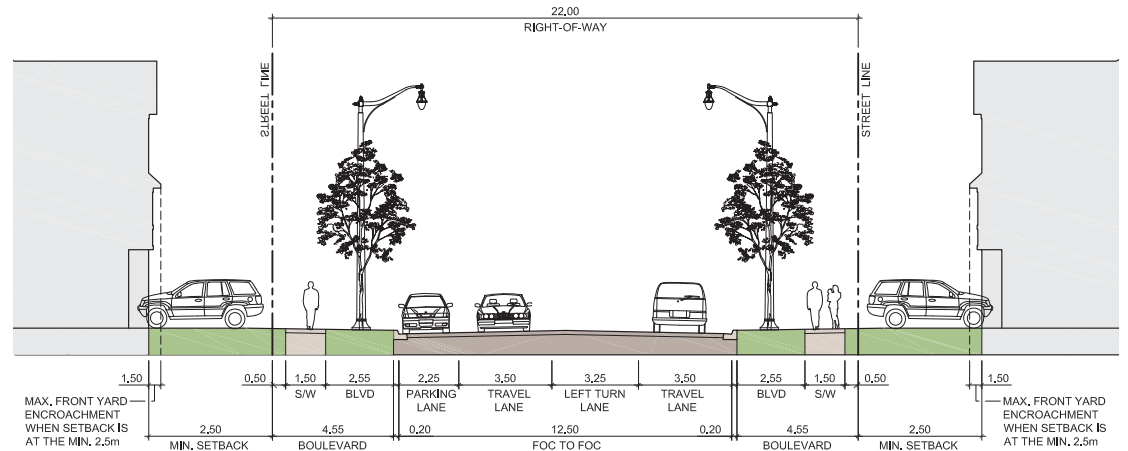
Avenue / Transit Corridor - 22.0m R.O.W. / 2 travel lanes / on-street parking on one side / 4.55m boulevard.
